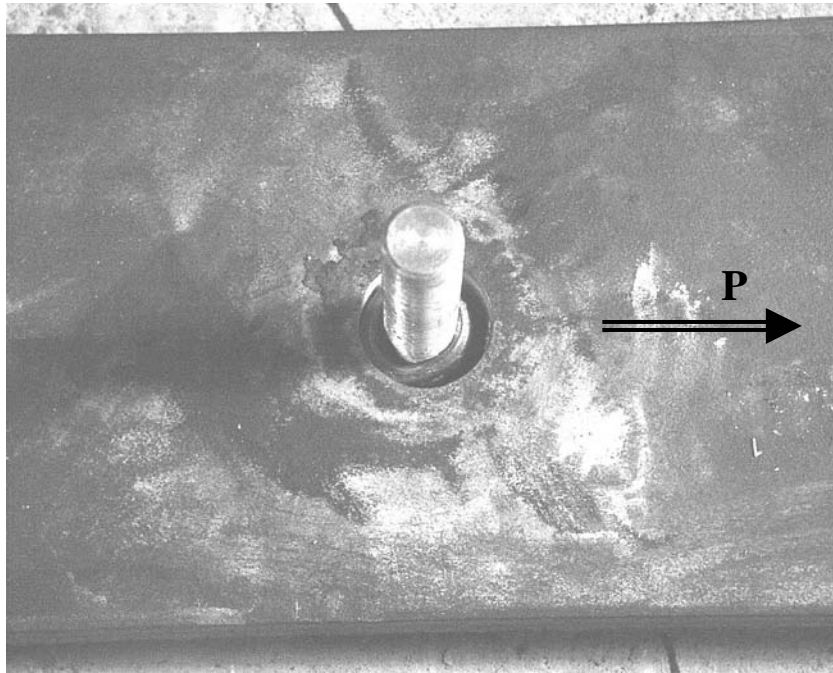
Gap between steel plate and anchor sleeve after testing MAXIB02
